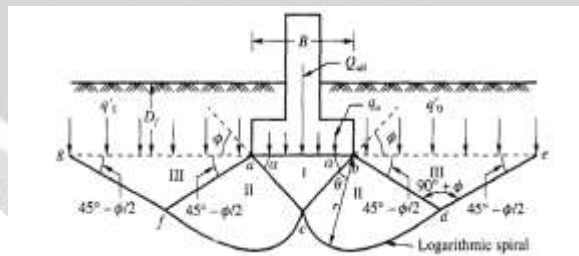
General Shear failure surface as assumed by Terzaghi for a strip footing
